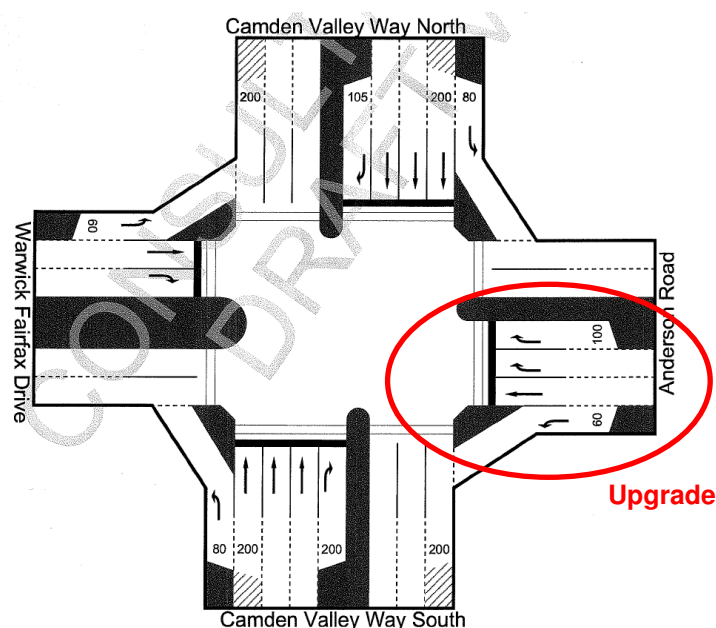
Proposed Anderson Road and Camden Valley Way Intersection
